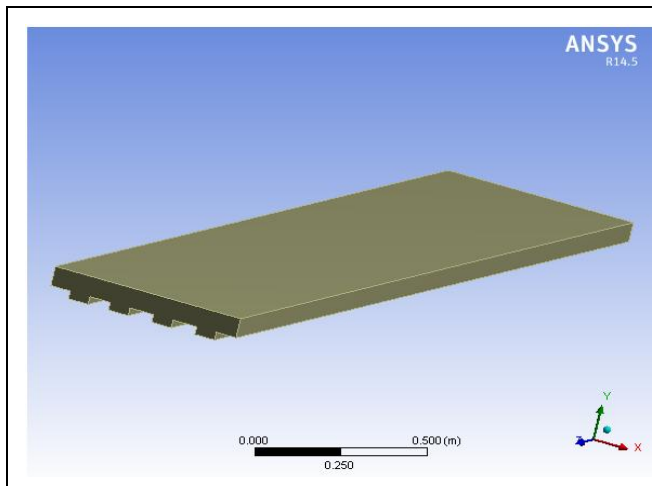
(A) Geometry of Bridge span with four stiffeners
